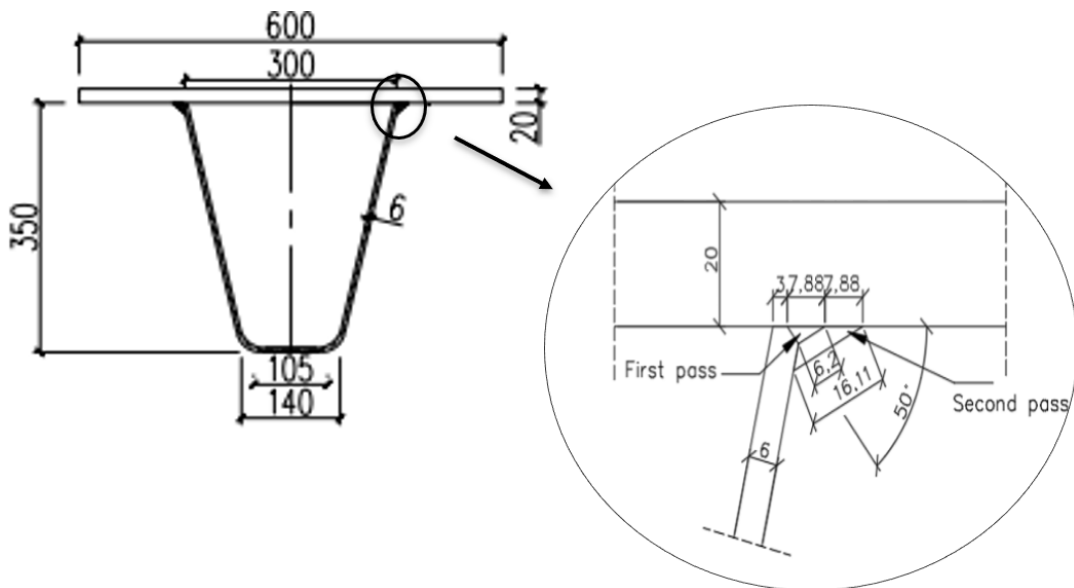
Trough to deck connection geometry and weld size for automatically welded connection
